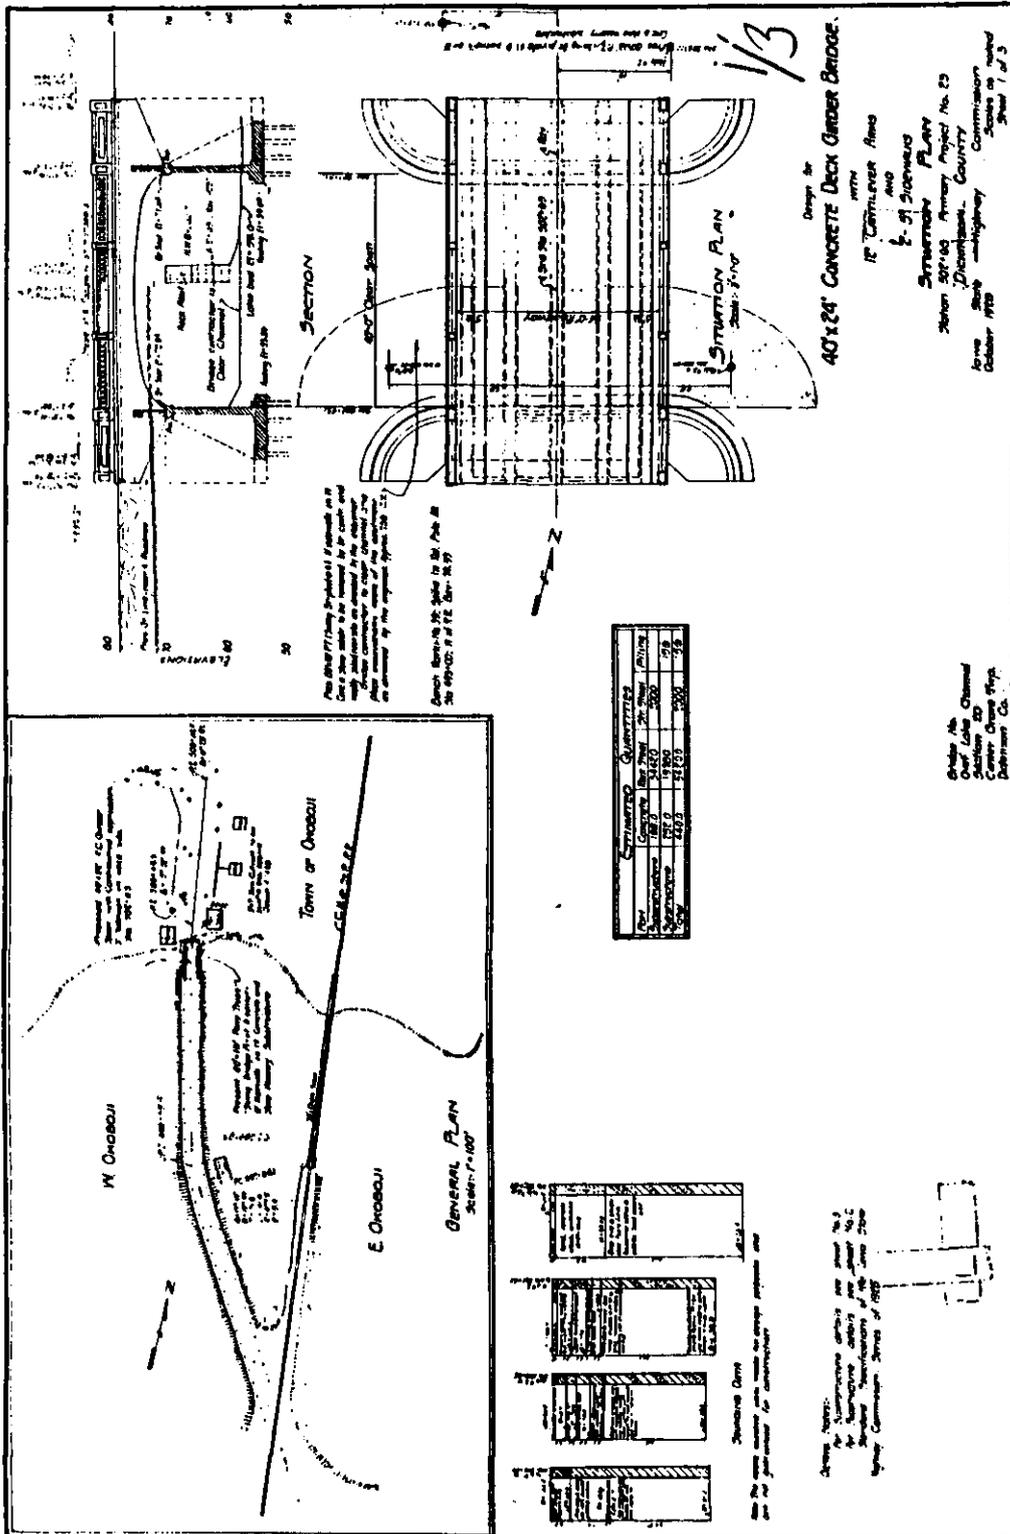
Construction Drawing for Okoboji Bridge, Iowa State Highway Commission, October 1928.
